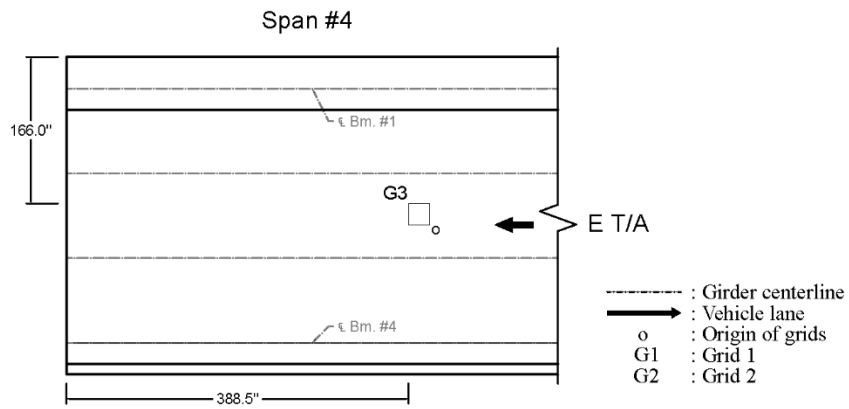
Plan View of the Bridge and Location of Grid 3
